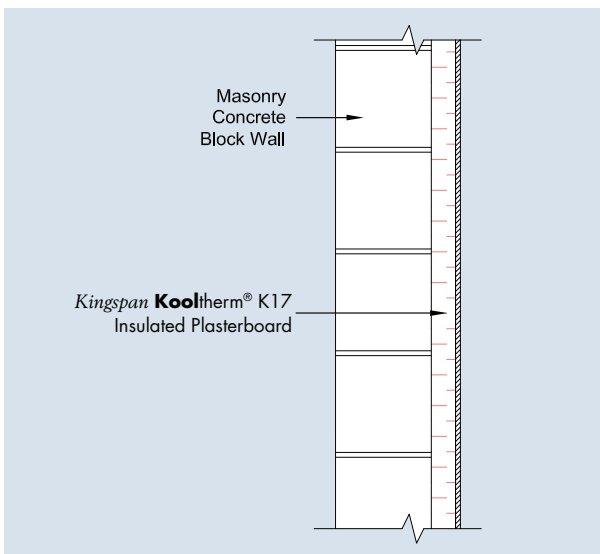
Side elevation - Masonry block wall with Kingspan Kooltherm® K17 Insulated Plasterboard
